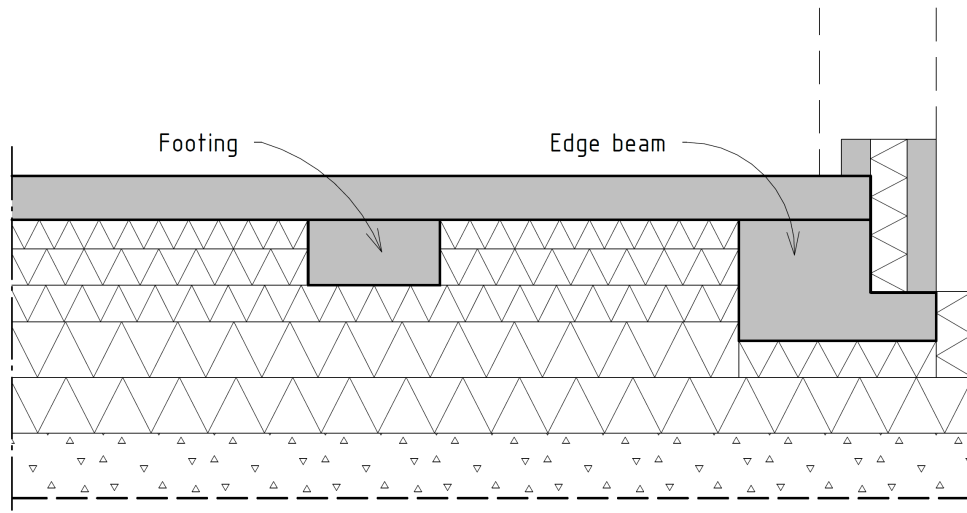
Illustration of a slab-on-grade showing an arbitrary footing and edge beam.
